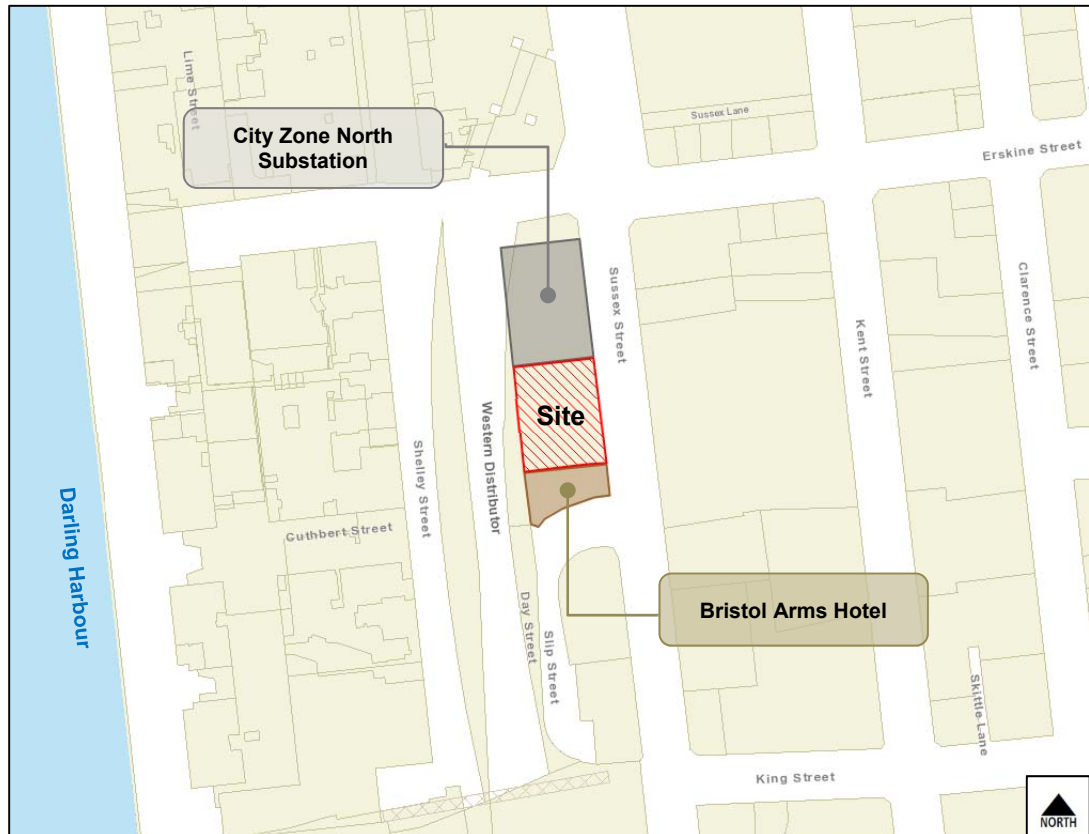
Location plan of 65-79 Sussex Street, Sydney
